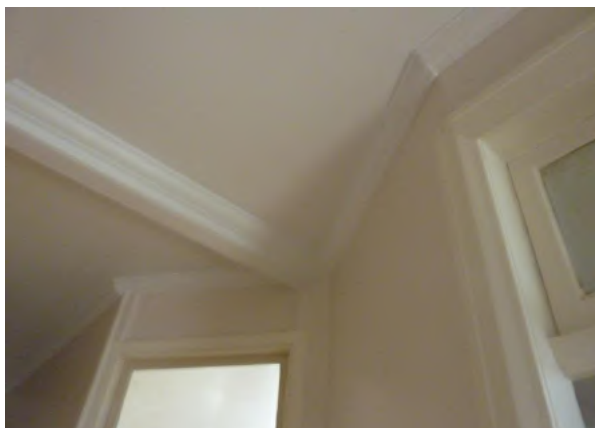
The hall ceiling at ground floor level (Flat 56B) showing the beaded timber beam and cornices. The expressed door frame on the left is original and set into a lightweight fly ash concrete wall. The door on the right is set into a rendered brick wall and has an original architrave. (Source: GML 2015)
